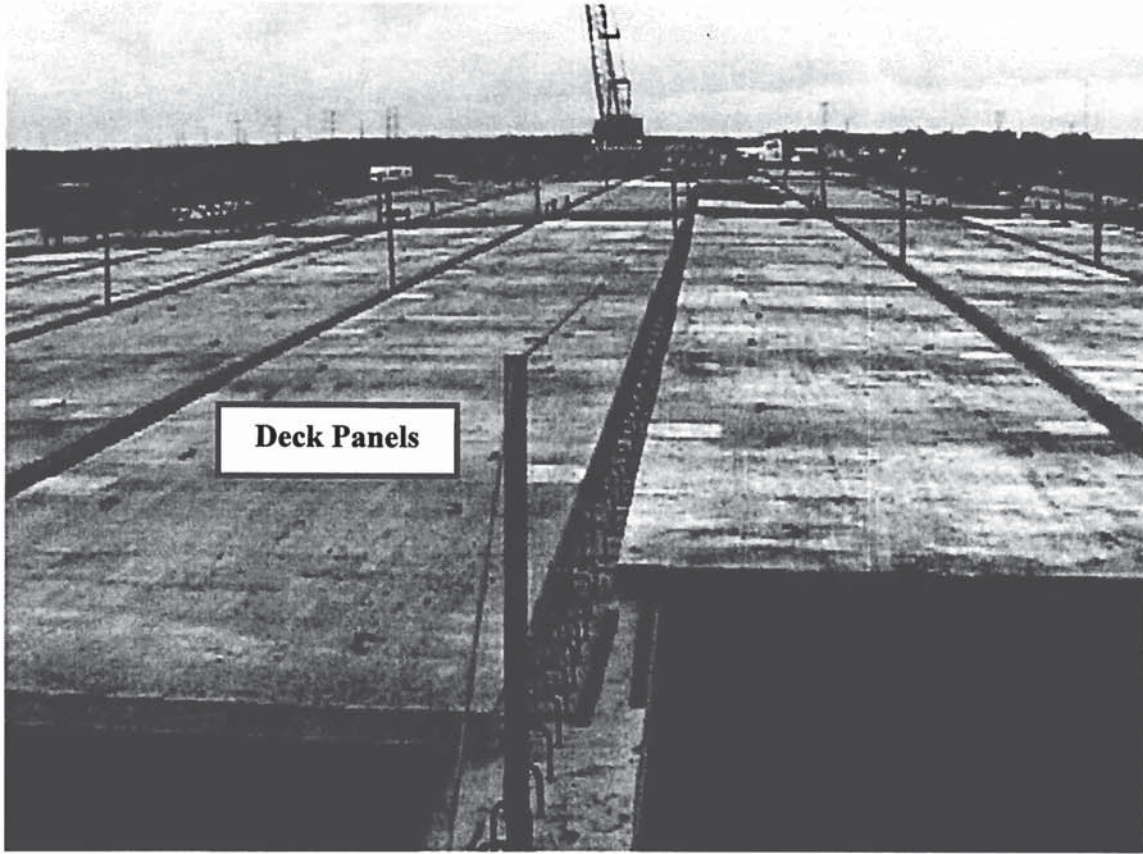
Placement of Deck Panels at Krenek Road Bridge Site
